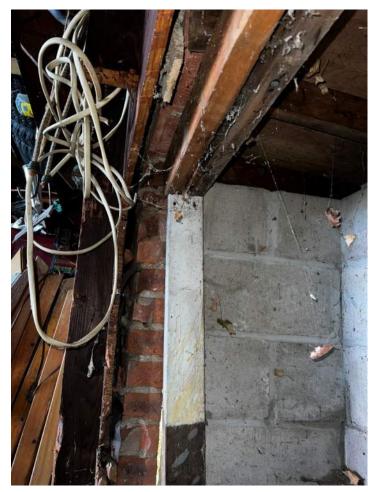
IMG_1029 – Brick is not properly supported from below at opening. Horizontal wood member supports the framing of the roof over the CMU bump-out.
